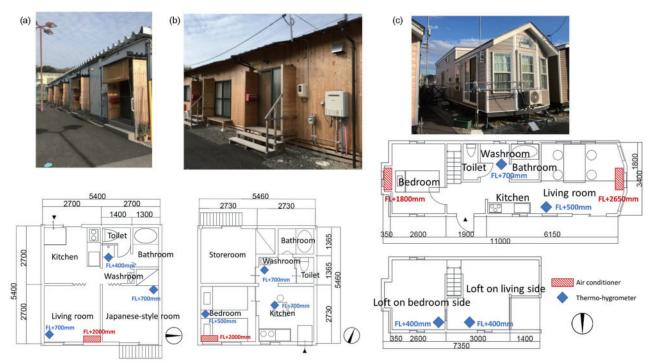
Appearance and floor plan of surveyed emergency housing (left: prefabricated house, center: wooden house, right: trailer home)
